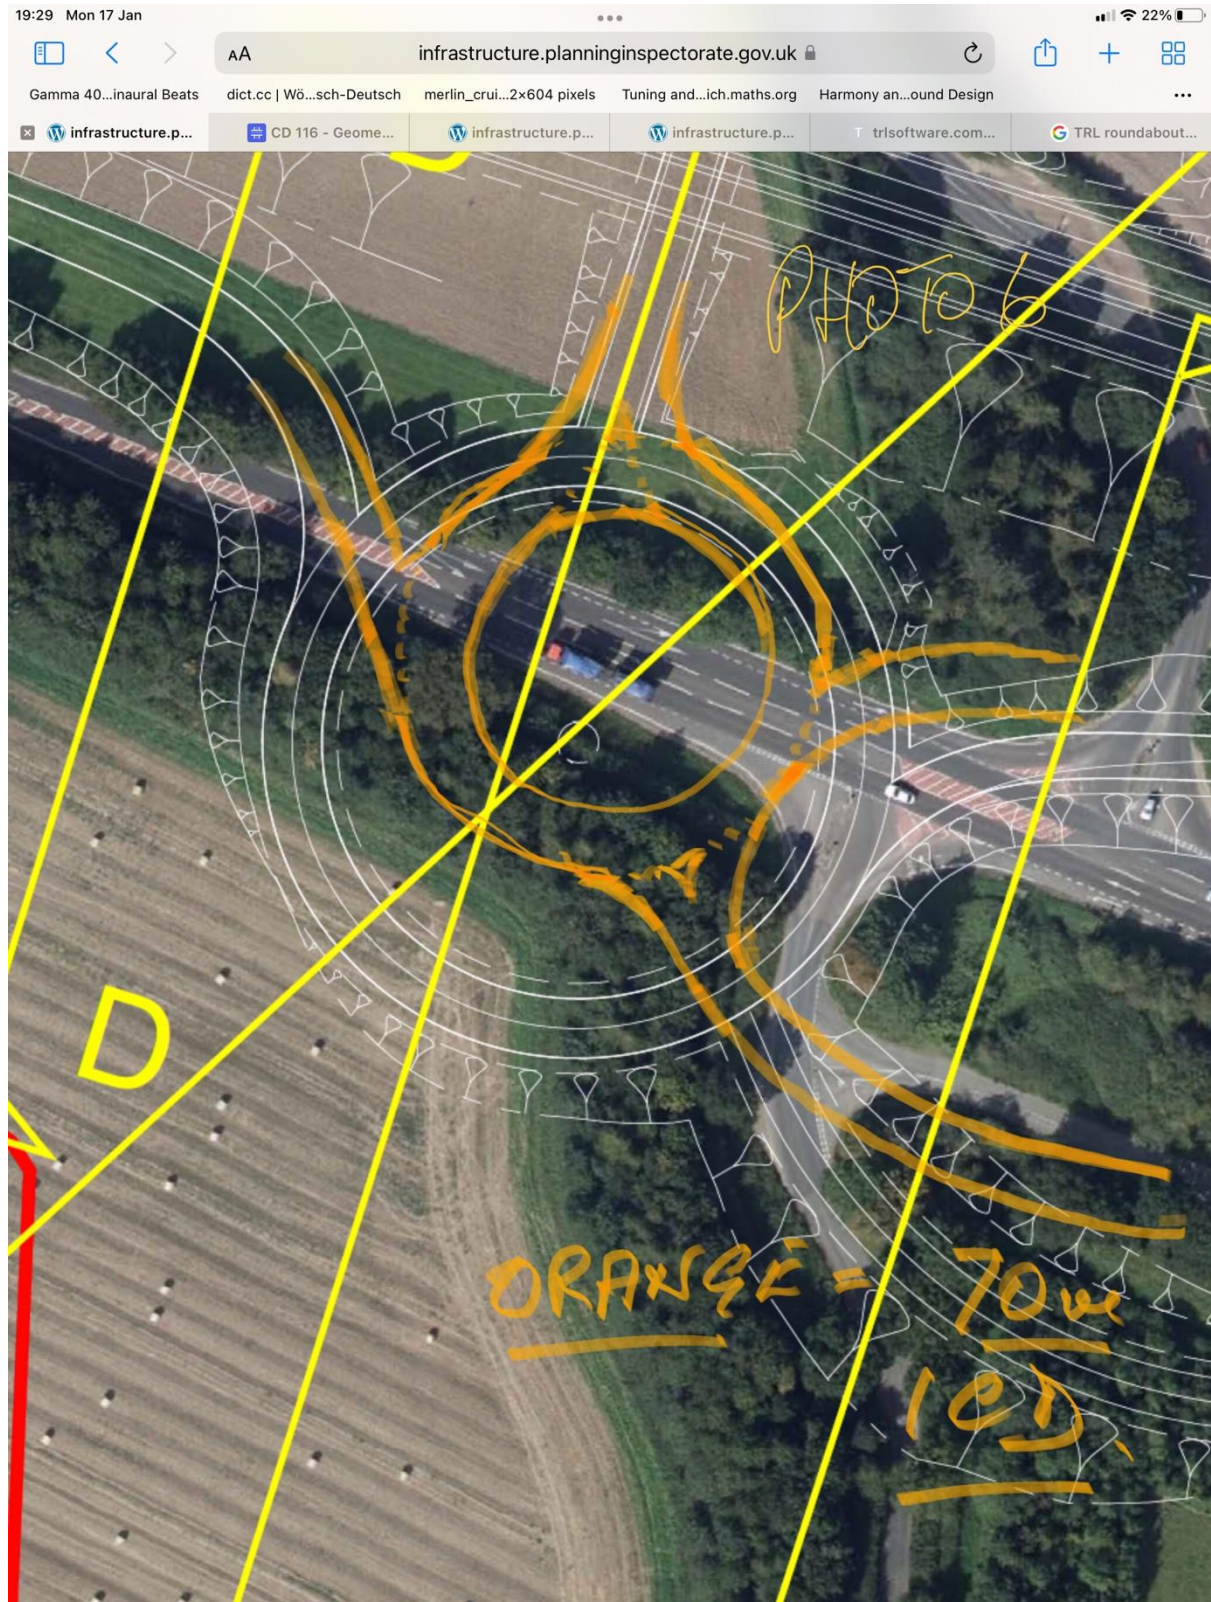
Wood Lane Junction south dumbbell with 70m roundabout overdrawn, aligned as photo 5.
